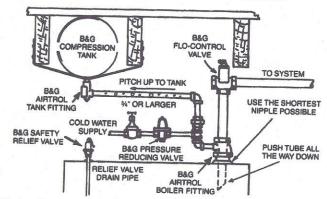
Horizontal piping between boiler and compression tank must be full size of tapping in the Airtrol Tank Fitting. If horizontal pipe length is more than 7 feet, increase to next larger size pipe—two sizes larger if horizontal pipe is more than 20 feet. Do not use a valve of any kind between the compression tank and boiler! It is unnecessary and prevents free passage of air into the tank. If a valve must be used, install a gate valve in the vertical pipe line.
